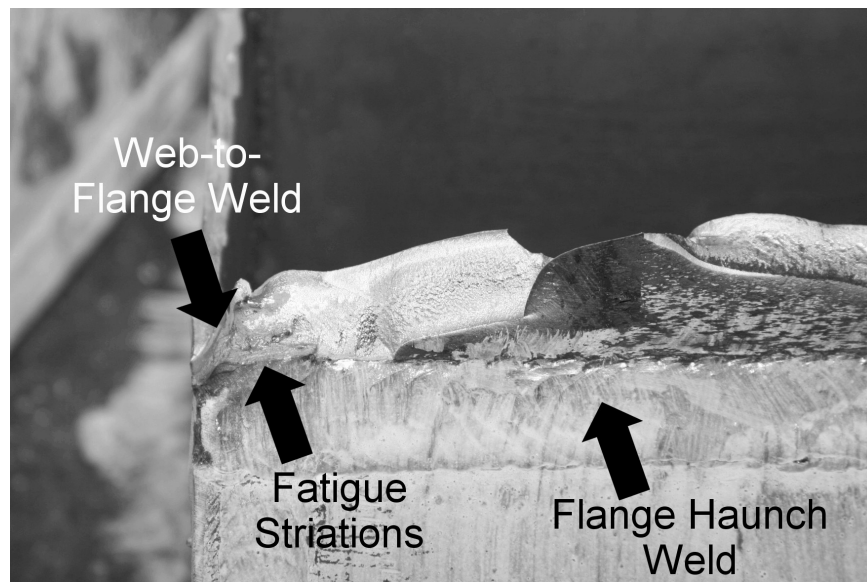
Fracture Surface of Bottom East Flange of Specimen X1L2.1
